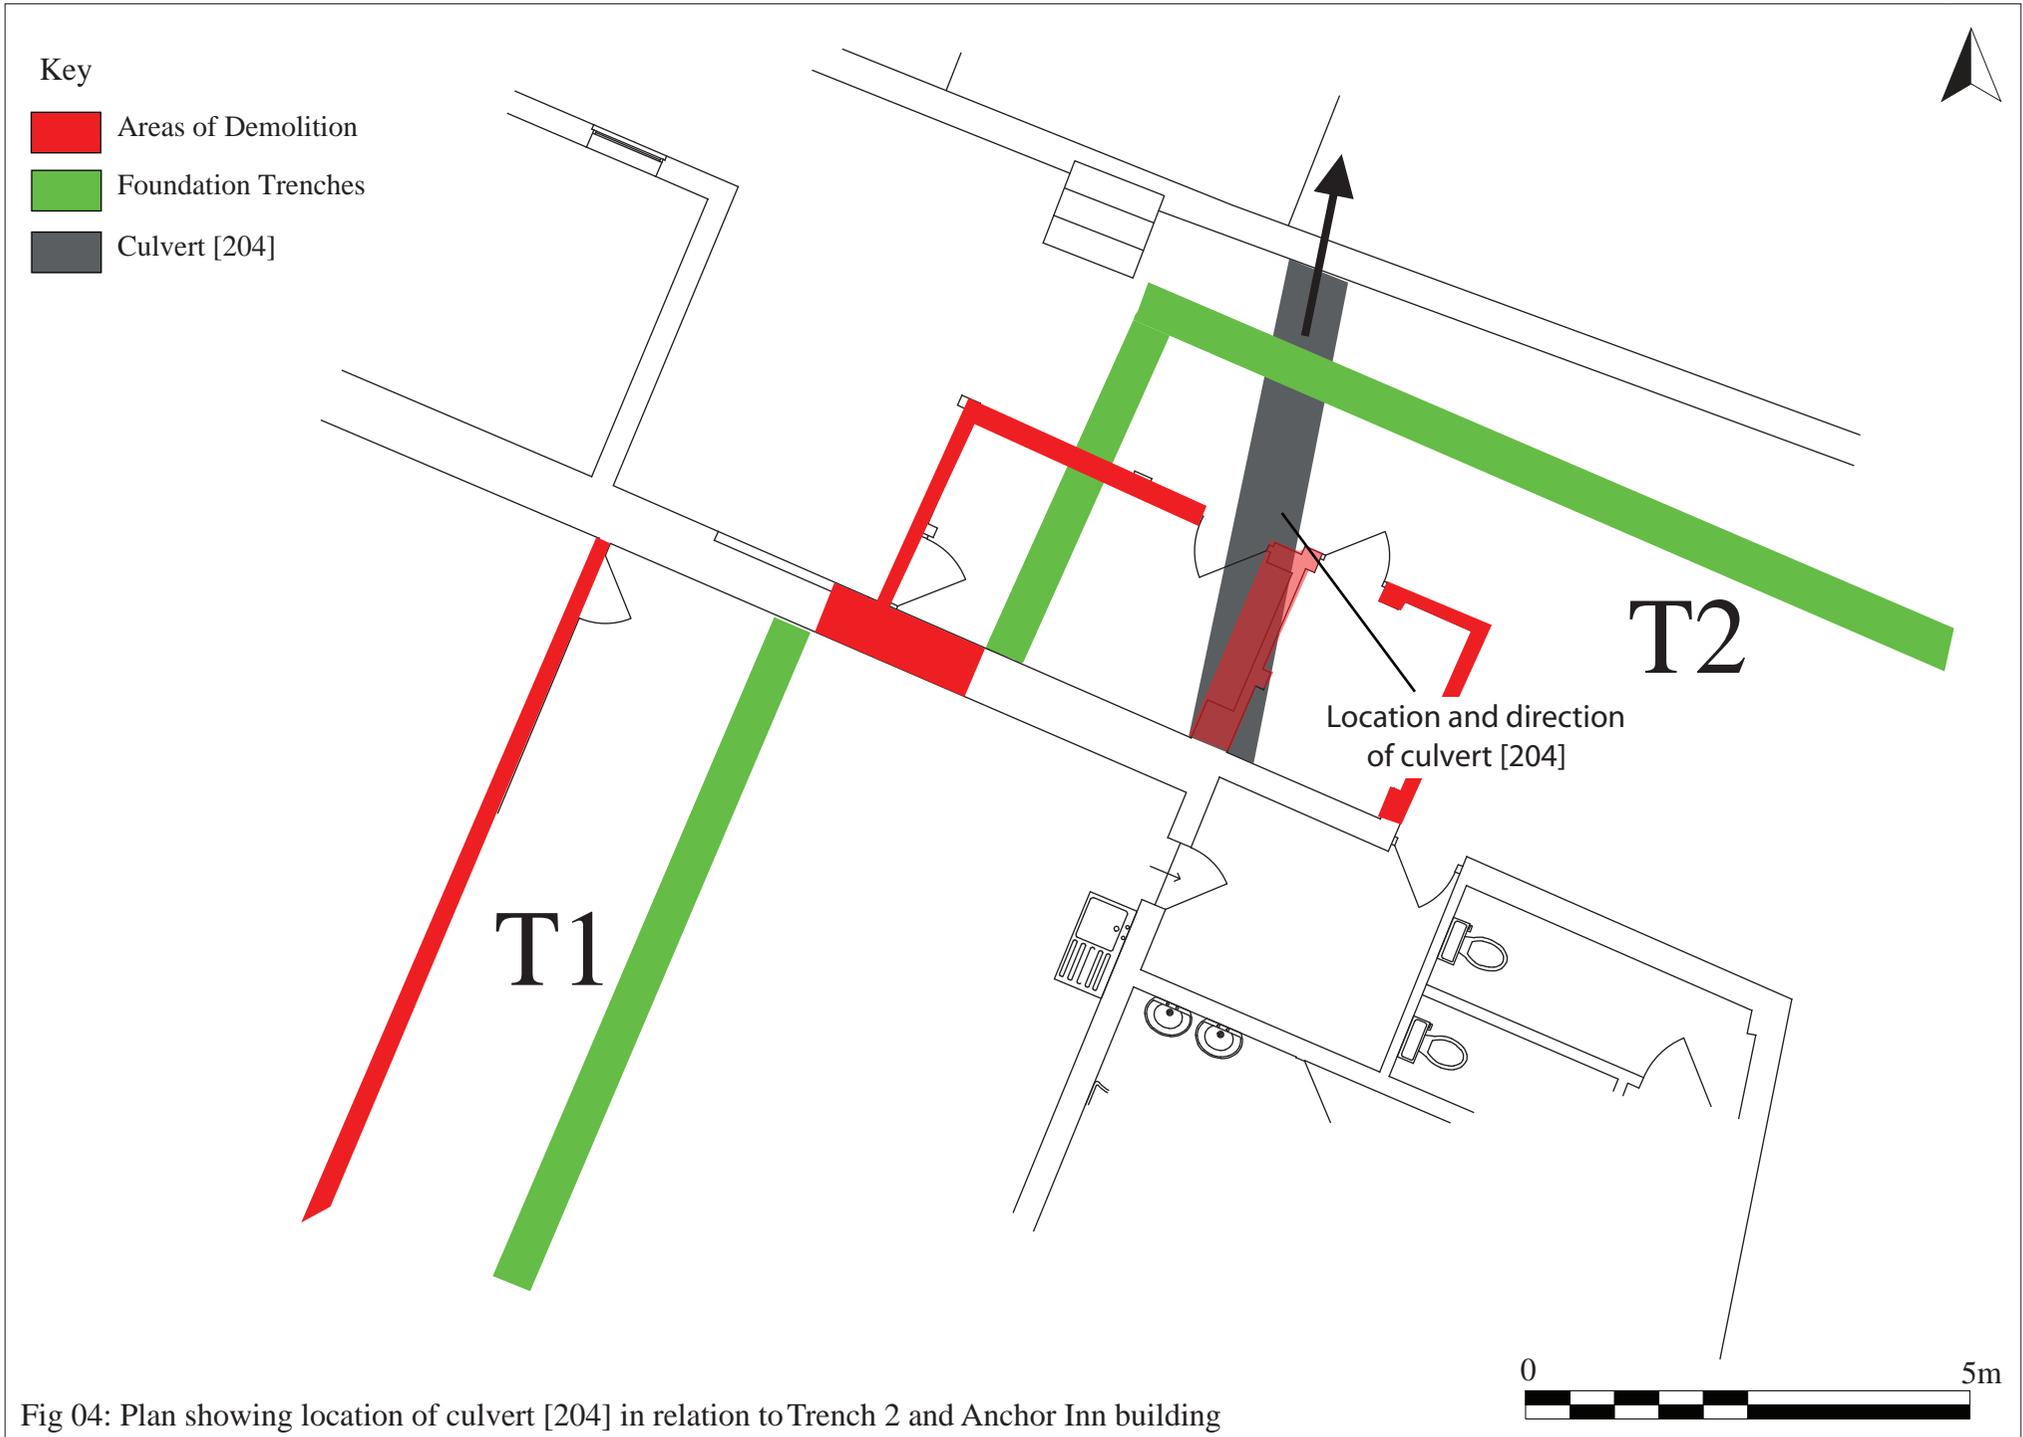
Plan showing location of culvert [204] in relation to Trench 2 and Anchor Inn building
